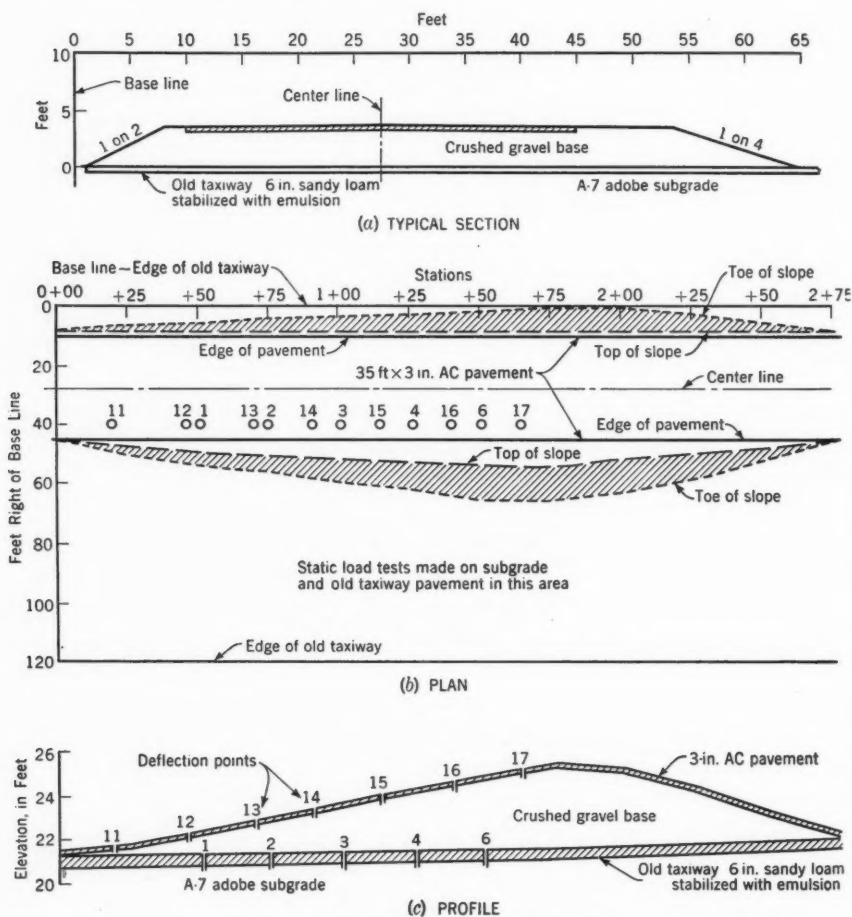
STOCKTON RUNWAY TEST SECTION
